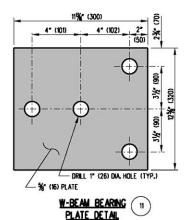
, SHEET 9 OF 10 HARDWARE
